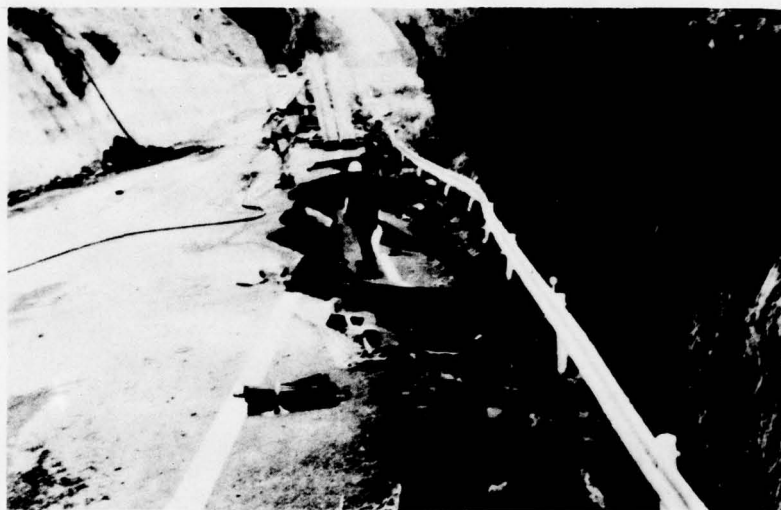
Examples of failures where the highways had been constructed using cut and fill techniques
